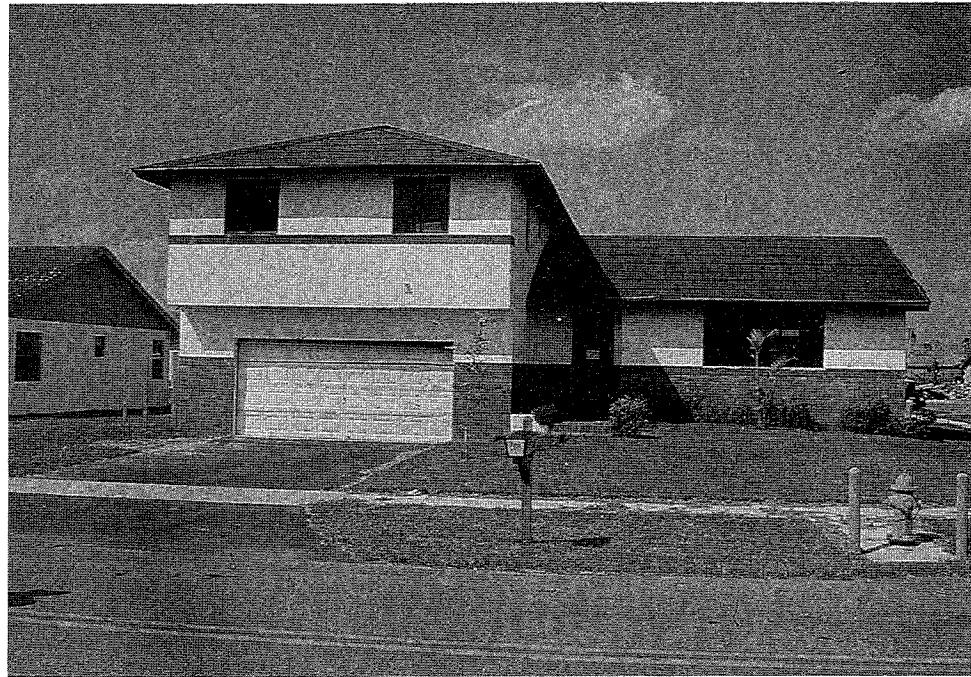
Example of a two-story, wind-damaged house. The wood-frame second story of this house was stressed, but it survived. The crucial damage was from water entering through broken windows, damaged roof coverings and some lost sheathing panels.
